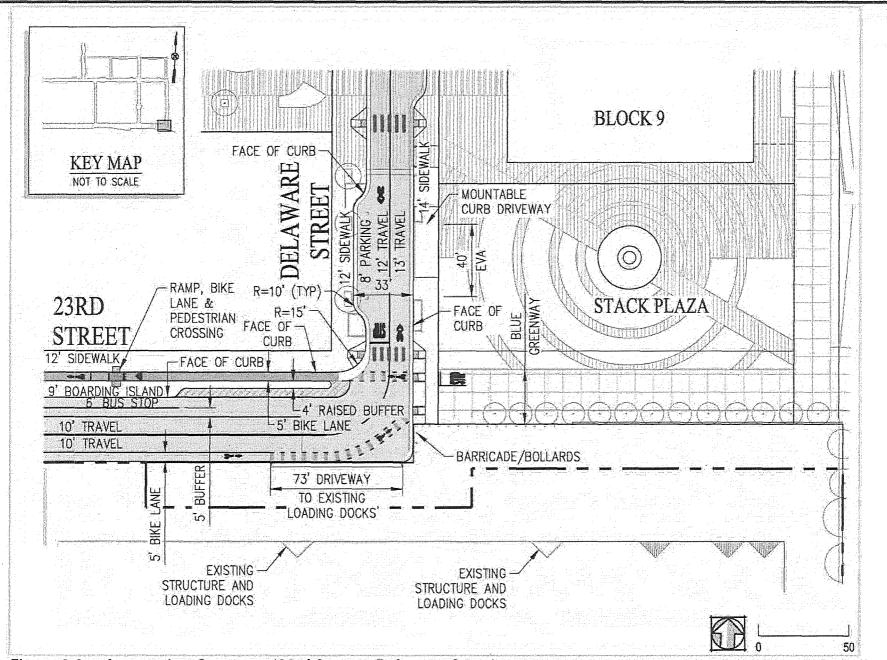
Intersection Geometry (23rd Street & Delaware Street)
